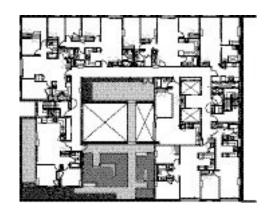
6th floor plan of new Jarvis Street Co-op by Teeple Architects showing common outdoor spaces with circulation around a common courtyard. Courtesy of http://www.cdnarchitect.com/. April 2009.
